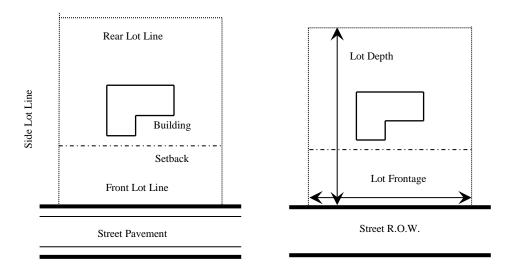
Building Setback Line, Front Lot Line, Lot Frontage, Lot Depth, Rear Lot Line, Street Right-of-Way, and Street Pavement
